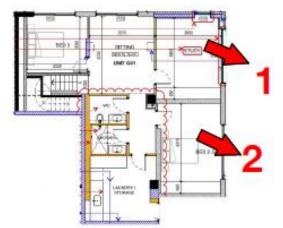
Photo Locations, G01 Lower Level, 182 Kurraba Road (Bedrooms)
